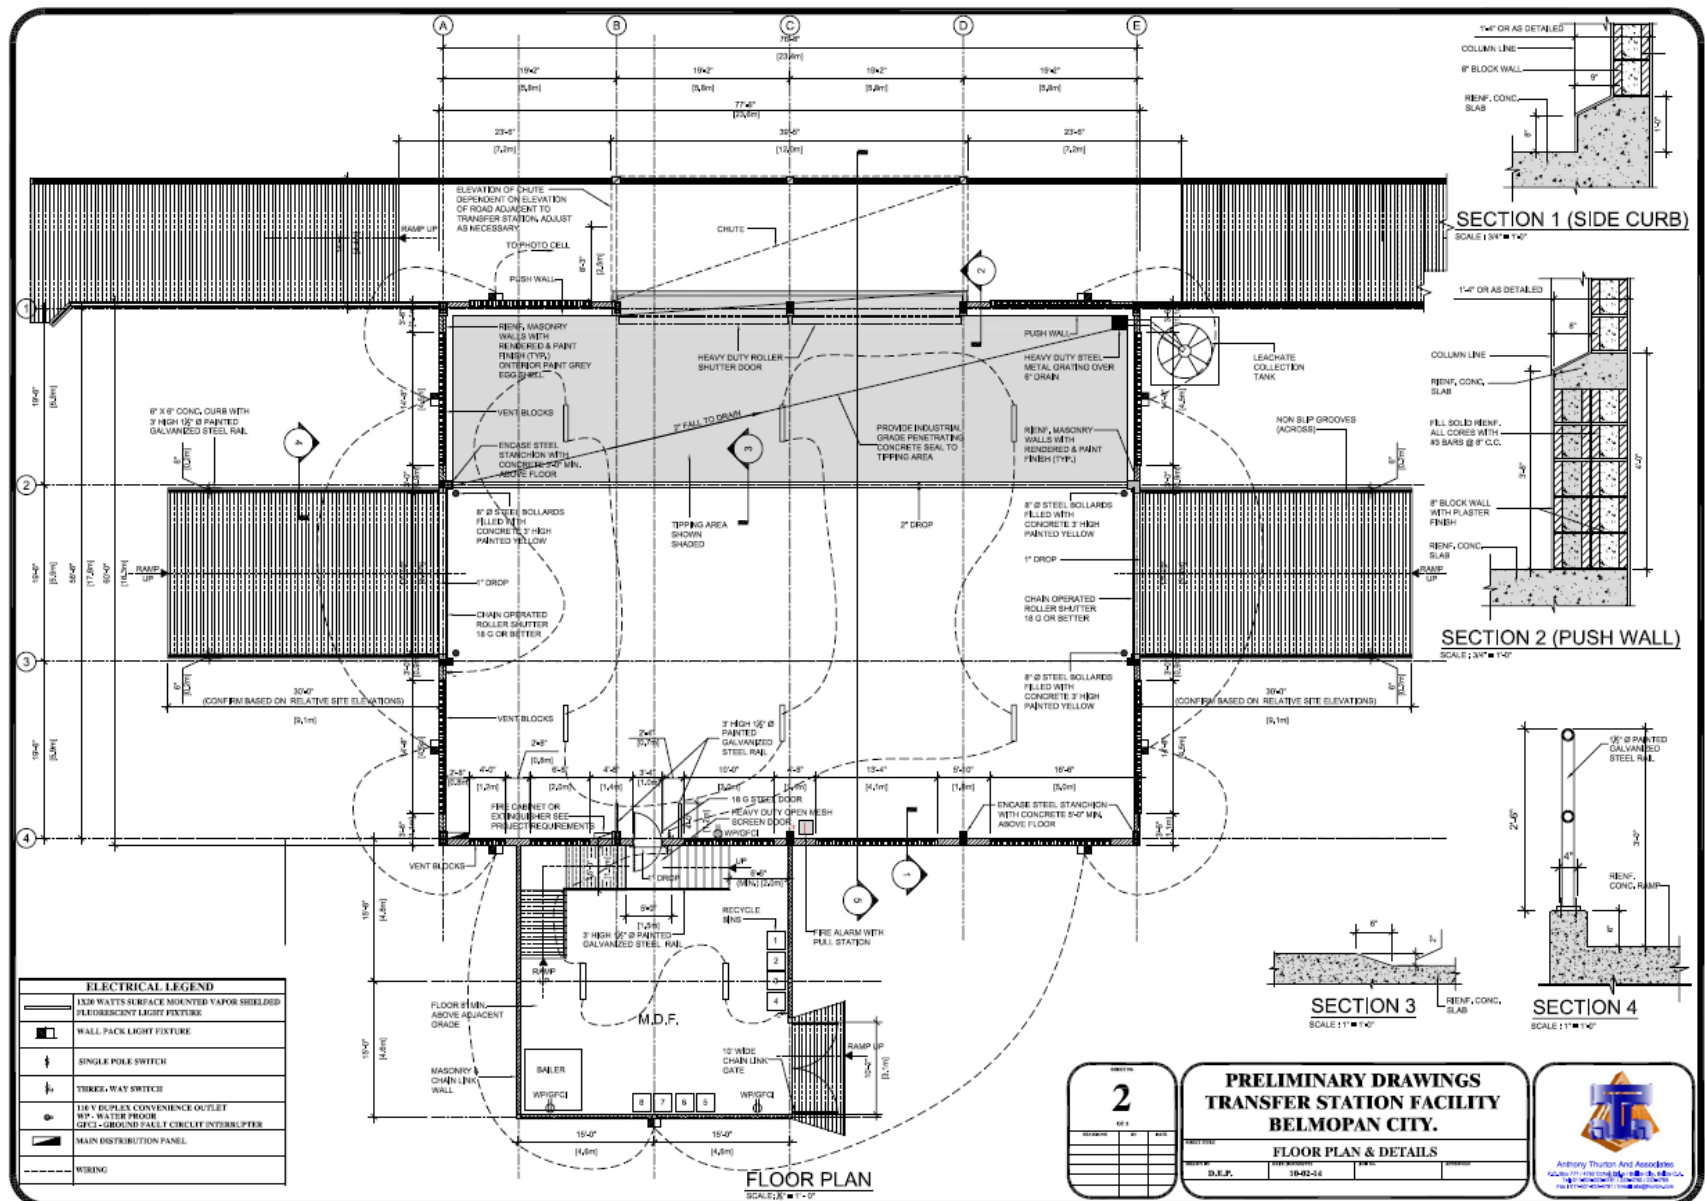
Proposed Belmopan Transfer Station Floor Plan
